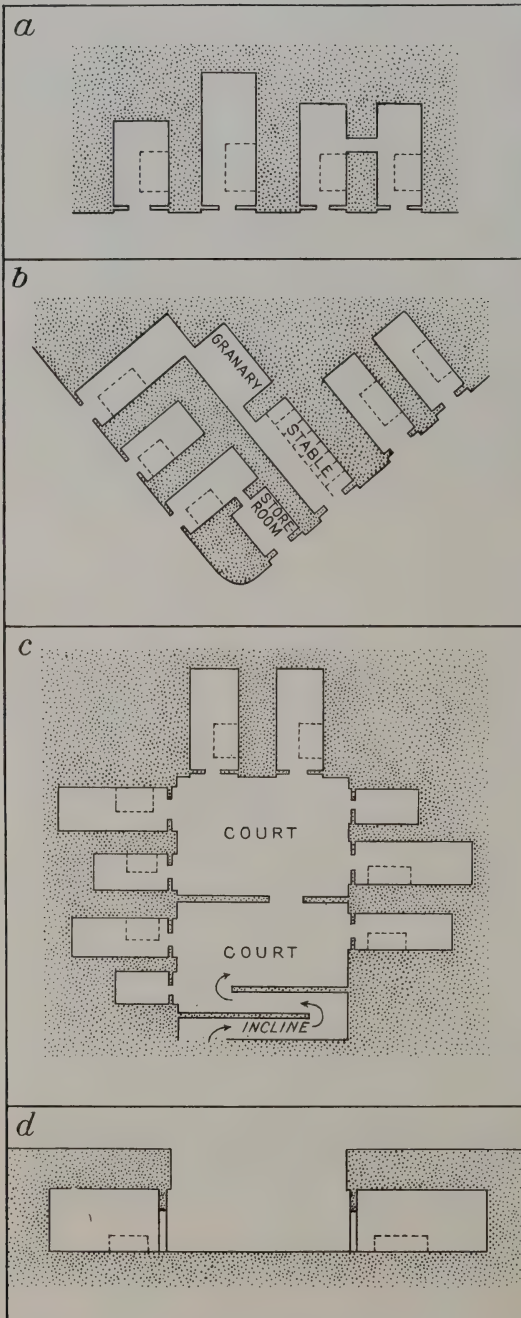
Plans of loess-cave dwellings: *a* and *b*, rows of dwellings; *c*, loess-pit village; *d*, dwellings in section.
